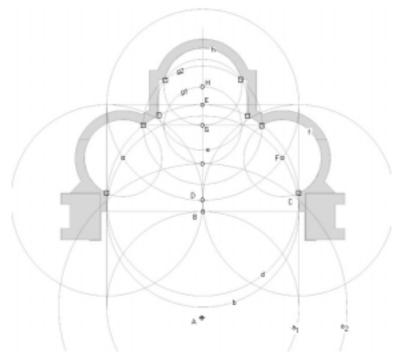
Hagia Sophia: ground floor plan tracing by means of circumferences (following the alphabetic order of the letters).
